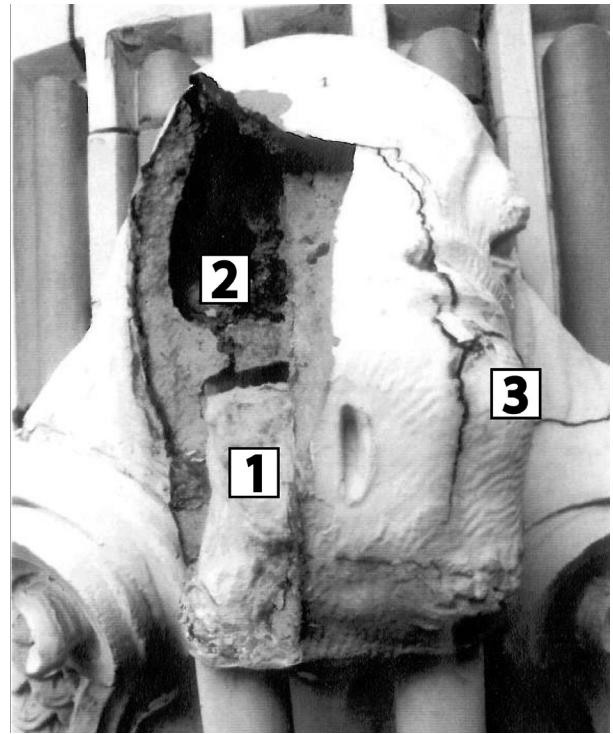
1996 inspection photo of walrus head S-1. Note the white grout sections filling the sinus cavity area of the walrus head (1). This meant there was no space left for the grout to expand into when the gypsum got wet. Note also the crack in the internal webbing (2). The damage to the internal structure of the head was so severe that this head had to be replaced. Note the cracks radiating from the dot on the top right of the walrus snout (3). This dot is the injection point for the 1982 grout installation and created a weak point in the terra cotta. (Credit: Morden & Slaton, WJE.)
